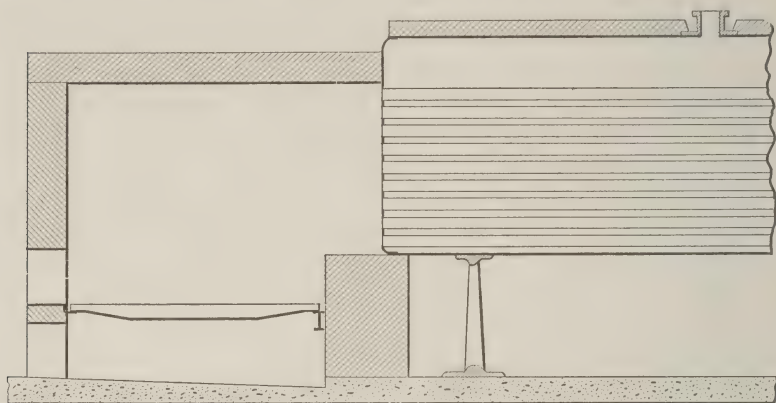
SETTING OF A FIRE-TUBE BOILER IN WHICH THE TUBES LEAKE
